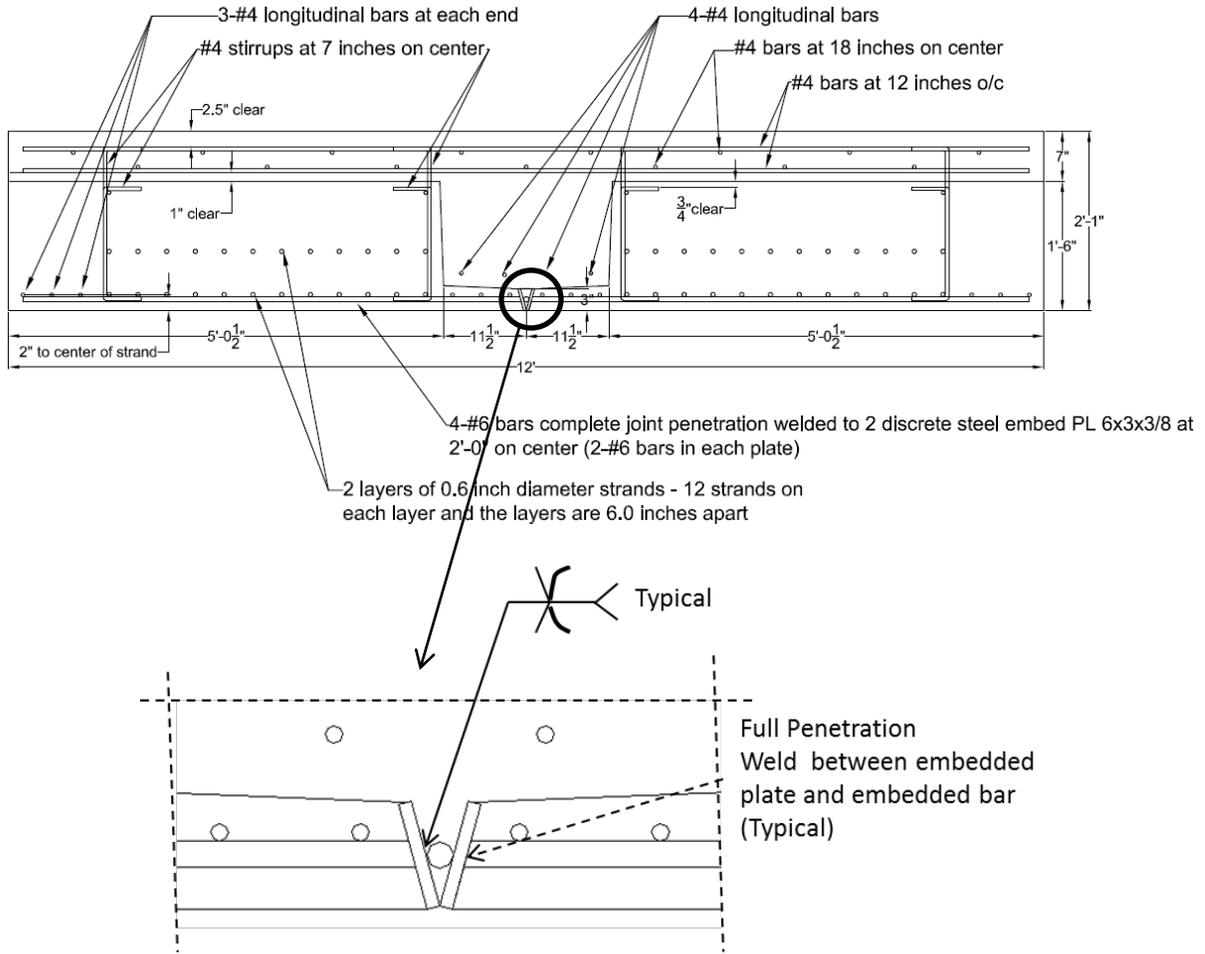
Reinforcing Details for Test Specimen #2 – Straight web cross-sectional shape with embed plate connection
